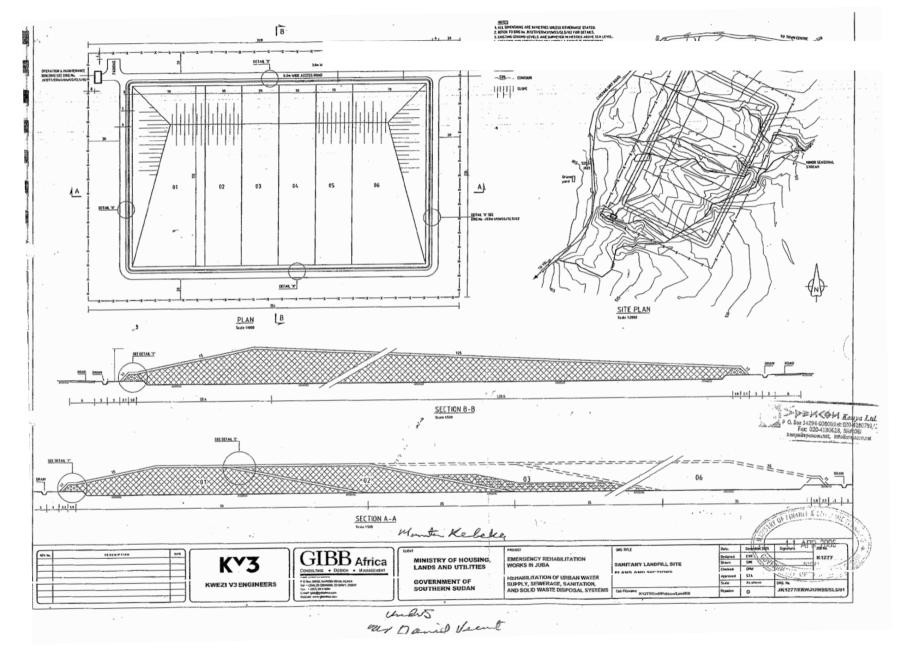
Plan and Section of Sanitary Landfill Site Designed by GOSS
